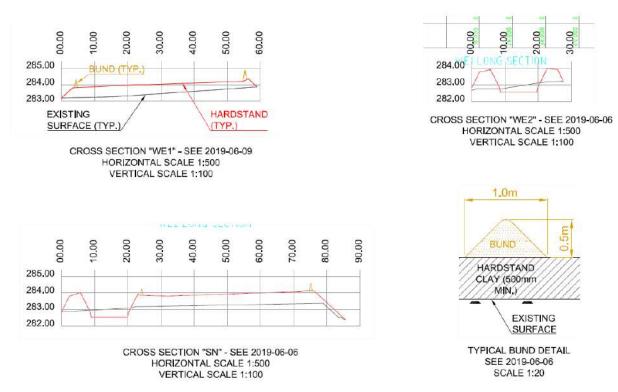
Stage 1 hardstand and leachate sump design cross-sections
